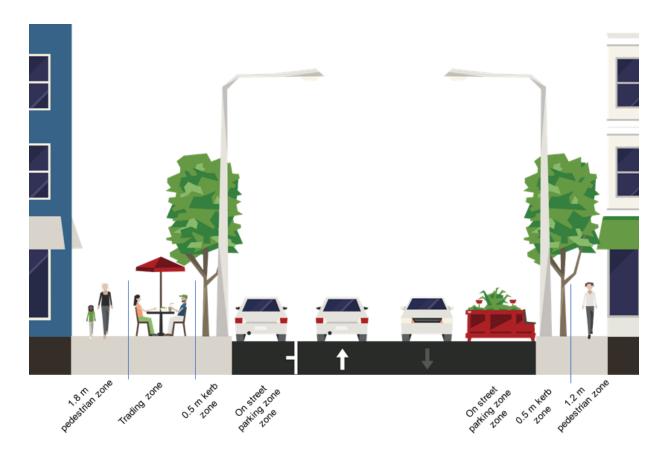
A street cross-section showing the pedestrian zone, the trading zone, the kerb zone, and the on-street parking zone. The on-street parking zone on the right-hand side of the road is occupied by a parklet. Image not to scale and distances are indicative only.
